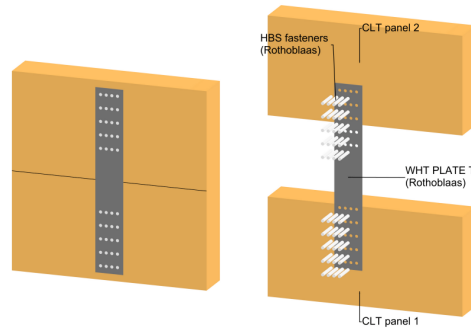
Steel WHT plate for timber-to-timber connection [27]
